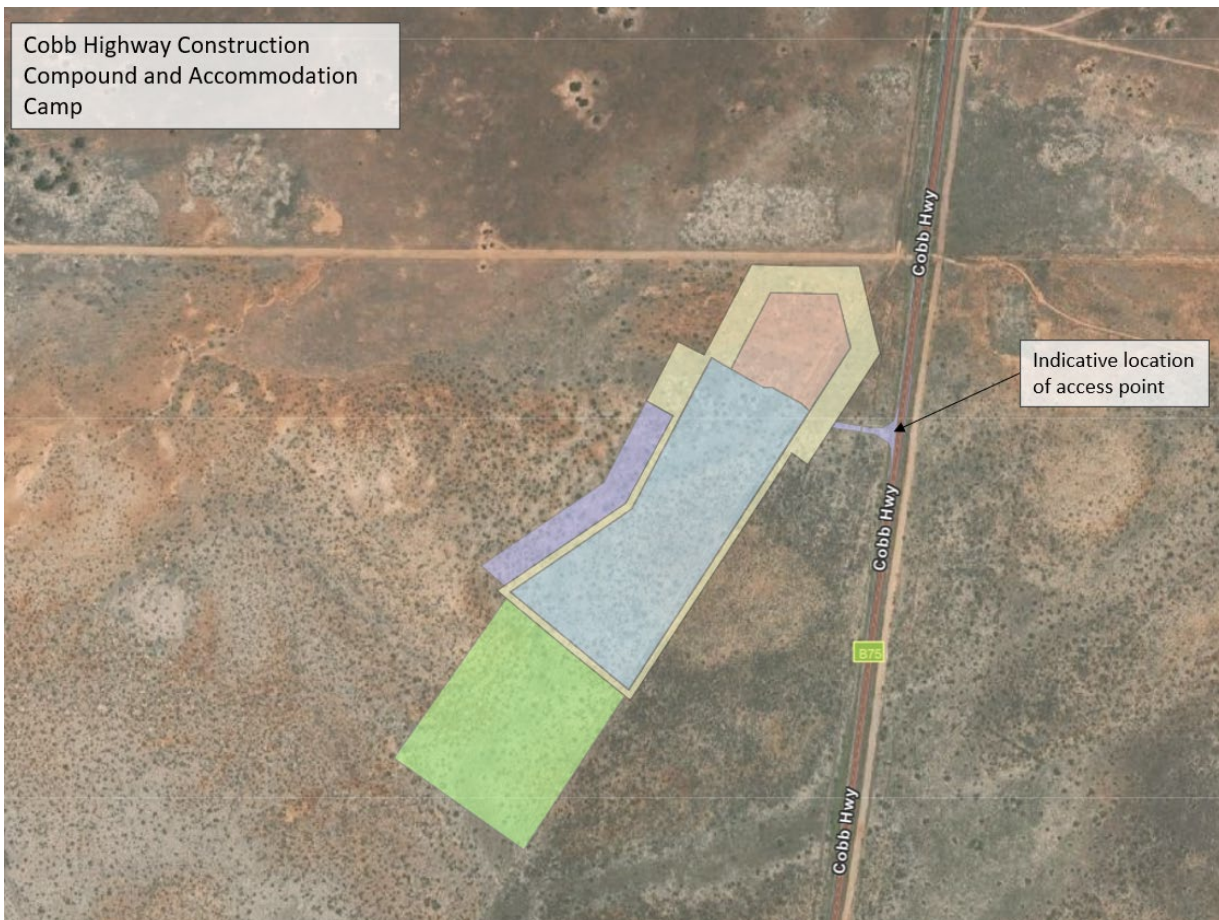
Indicative access point to Cobb Highway construction compound and accommodation camp
